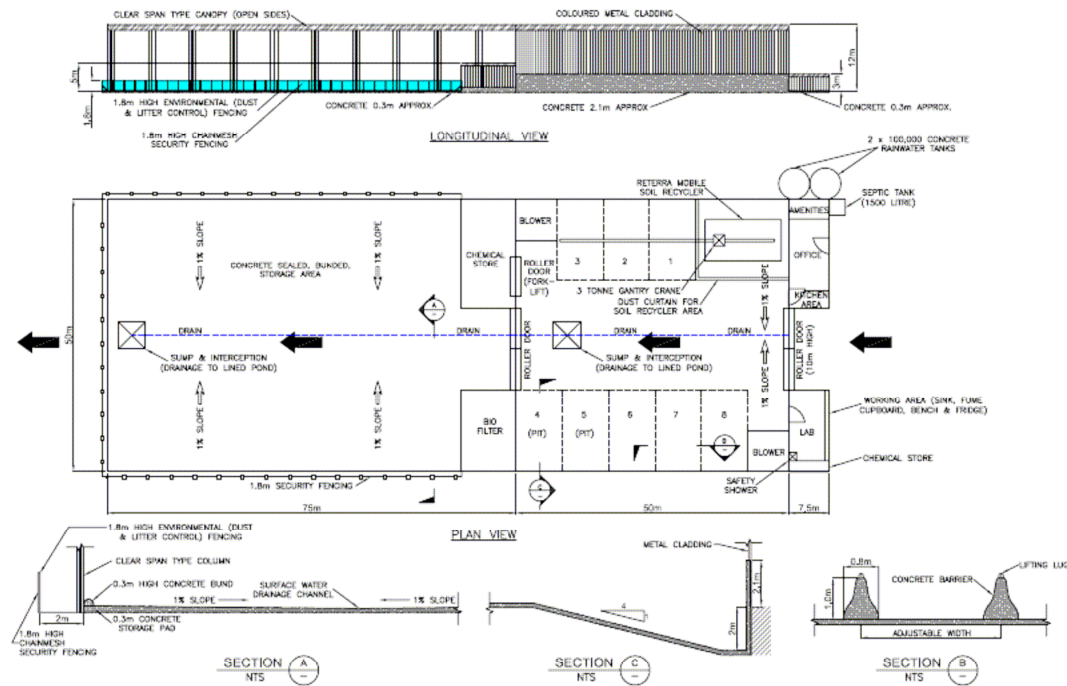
Proposed Multi-Purpose Waste Treatment Facility: Site Layout
